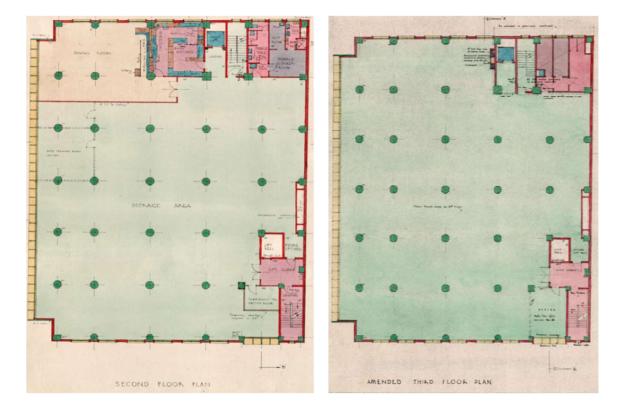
Original Second and Third Floor plans, dated 1956 (construction).
